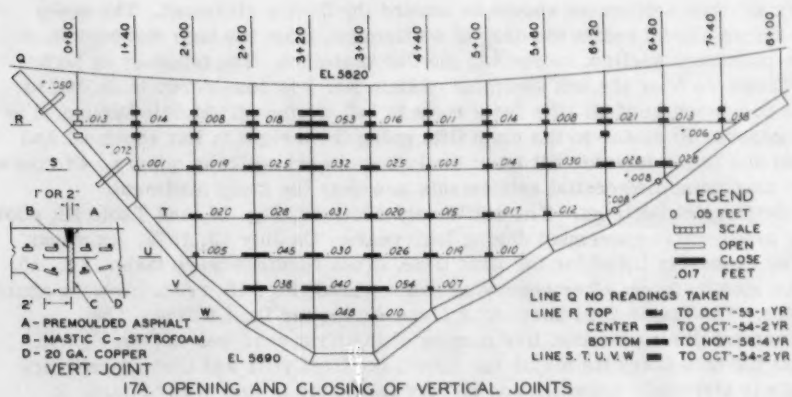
MOVEMENT OF JOINTS, LATERAL MOVEMENT, AND FACE CRACKS - LOWER BEAR RIVER DAM NO. 1
